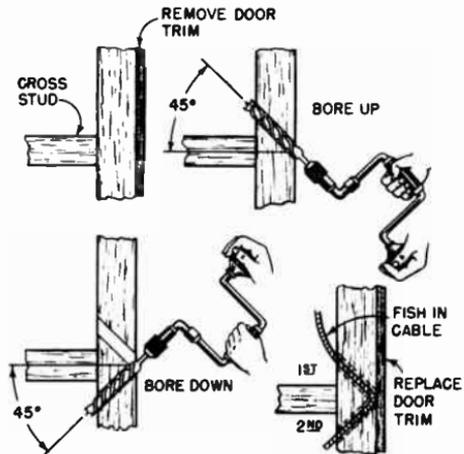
Bypassing an obstruction without seriously marring the wall.
